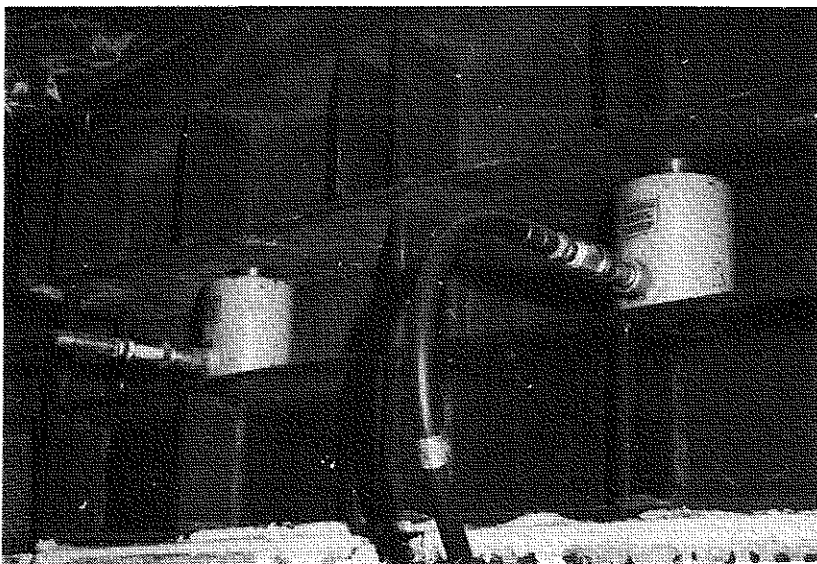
House I: detail of the equipment for application of hydraulic loading on specified wall elements
